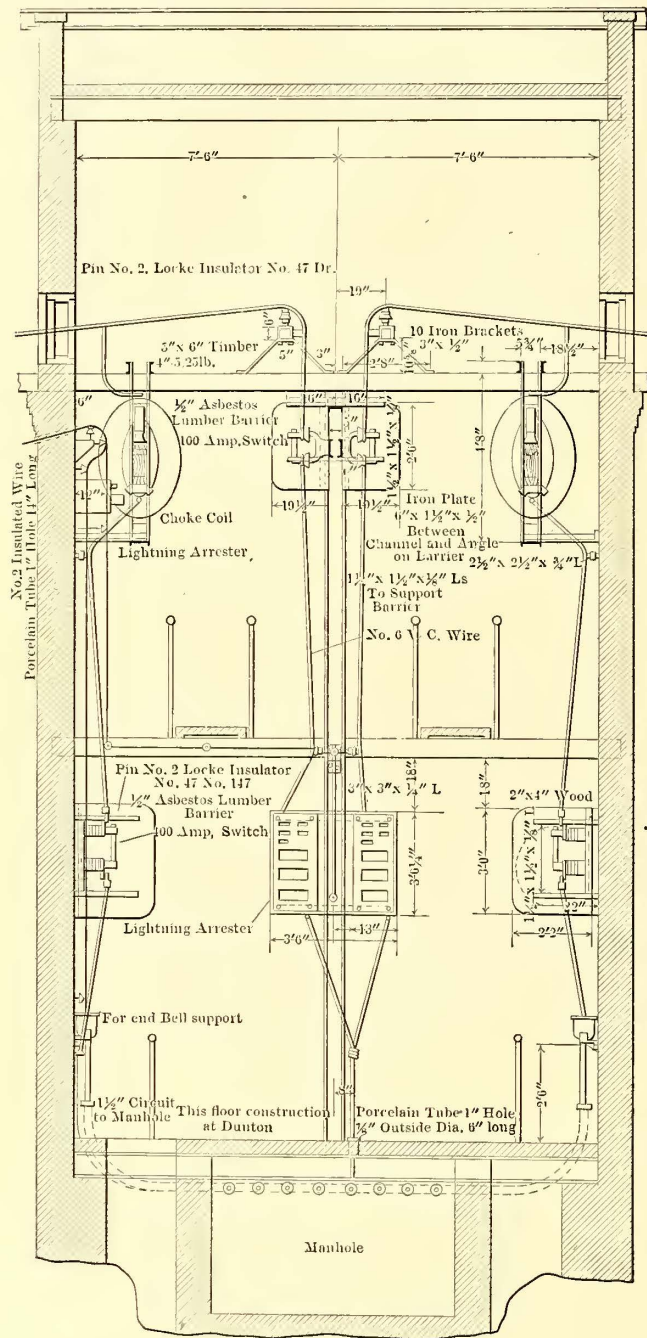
CROSS-SECTION OF LIGHTNING ARRESTER HOUSE. MAIN TRUNK LINE
